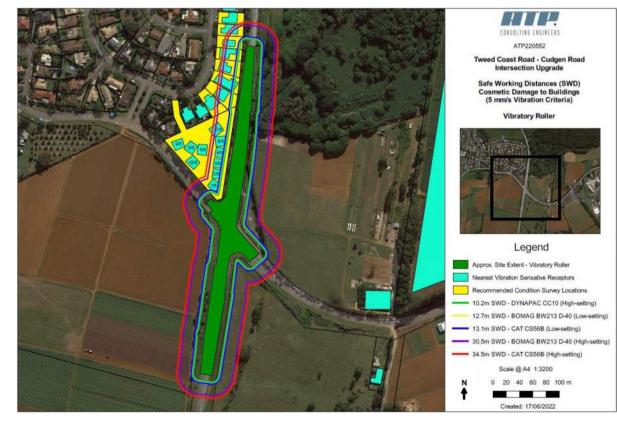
Safe working distances for vibratory roller to prevent cosmetic damage to buildings.
